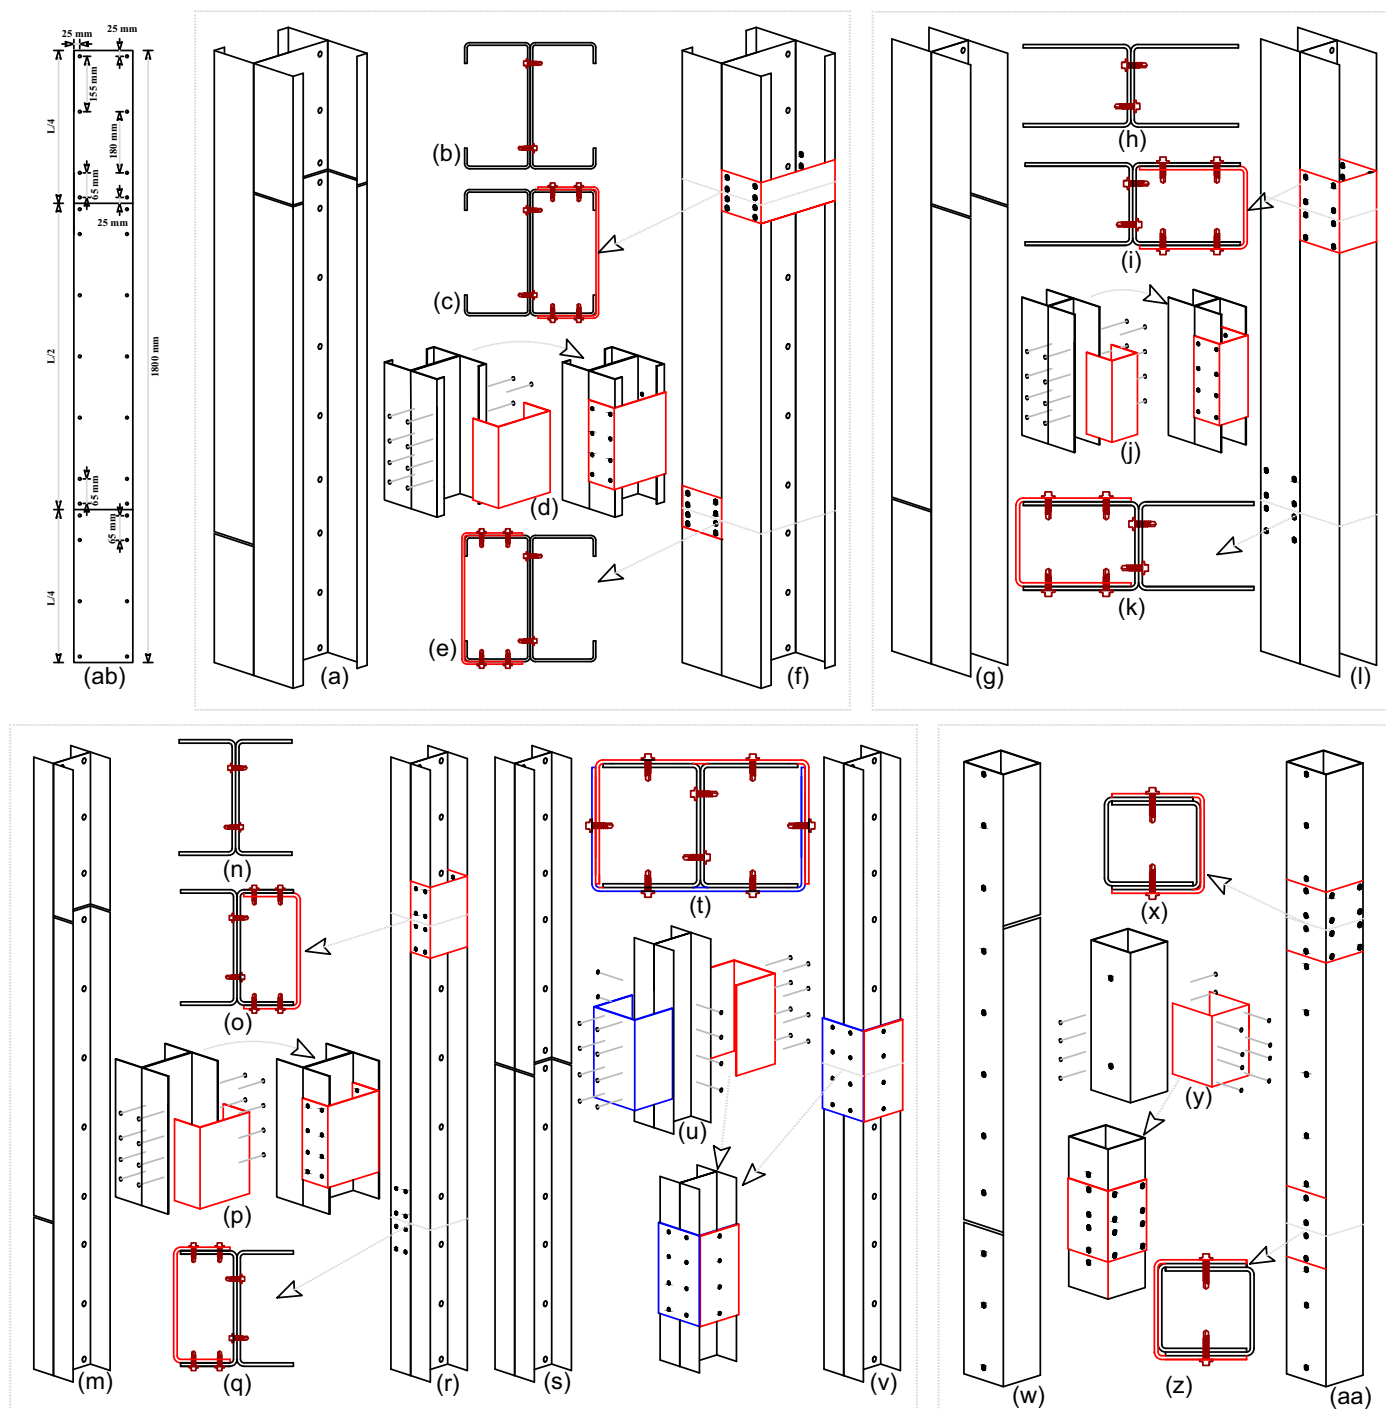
Splice connection configuration, arrangement, and installation methods for cold-formed steel construction: (a–f) over-size splice for the back-to-back connected lipped channel built-up column assembly; (g–l) same size splice for the back-to-back connected unlipped channel built-up column assembly; (m–r) same size splice for the back-to-back connected unlipped channel built-up column assembly; (s–v) over-size splice at the mid-length for the back-to-back connected unlipped channel built-up column assembly; (w–aa) over-size splice for the face-to-face connected unlipped channel built-up column assembly; and (ab) Dimensions and spacing configuration in the splice connected built-up column.
